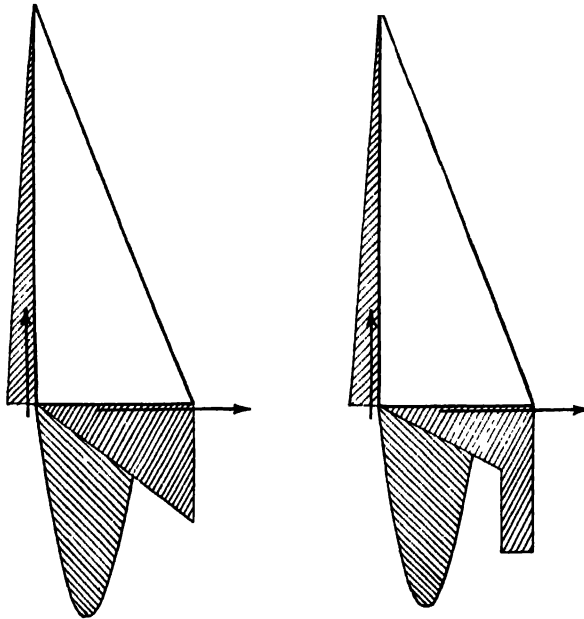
Loads on Counterfort of Counterforted Retaining Wall.
